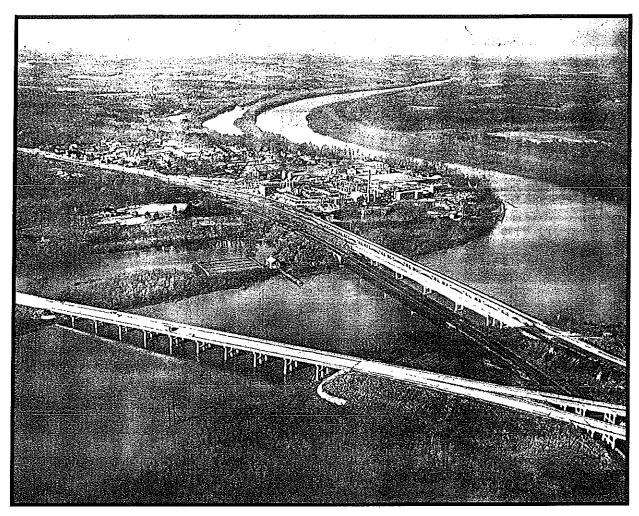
Late 1950s aerial photograph depicting I-85 bridge at lower left, North Carolina Finishing Company and mill village at center, railroad and US 29 bridges at right, and piers of Beard's Bridge at upper right
